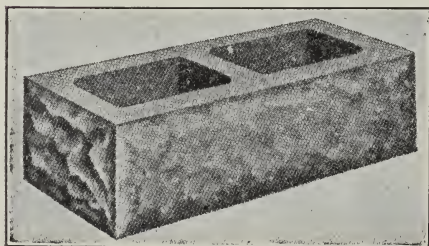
Concrete Corner Block. Three Webs and Two Large Cores.
